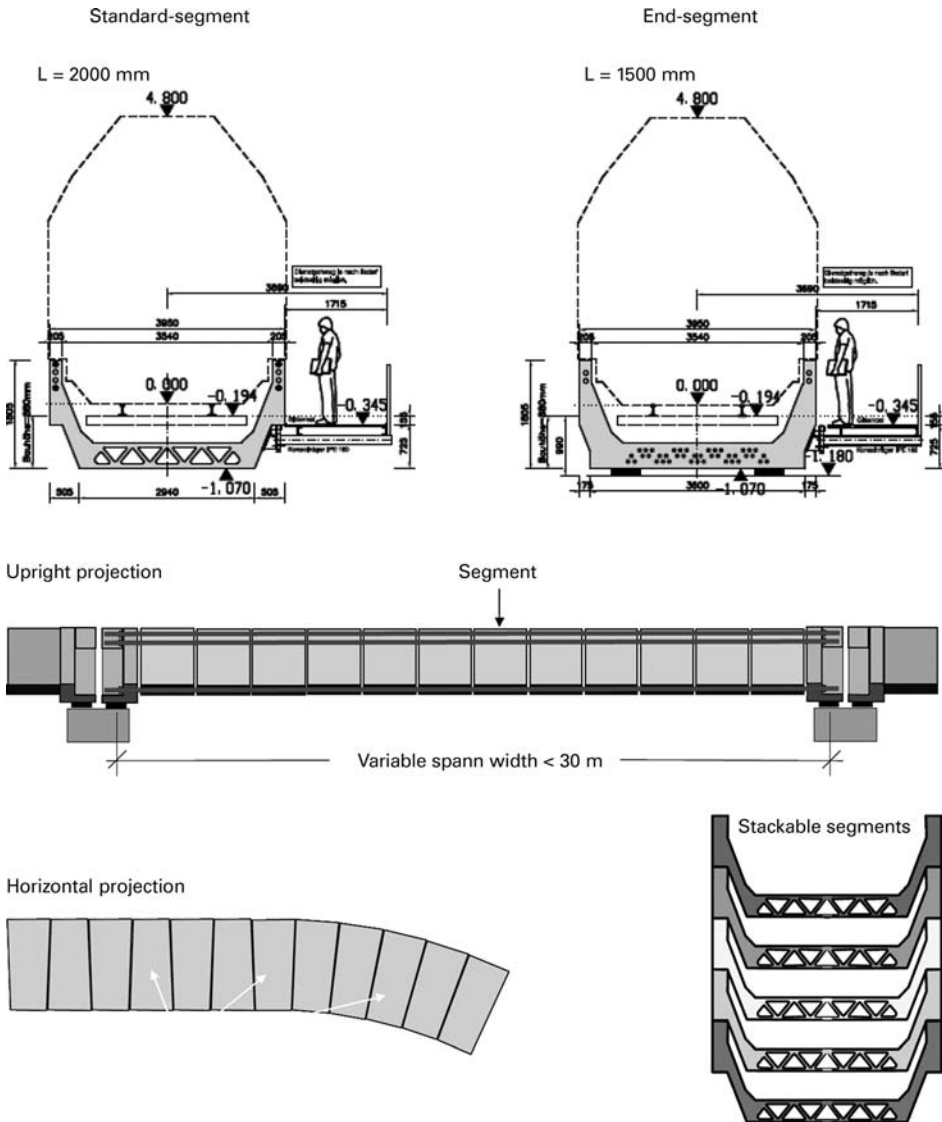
Sections, longitudinal section and concept for a modular temporary bridge made from UHPC for high-speed railway lines
